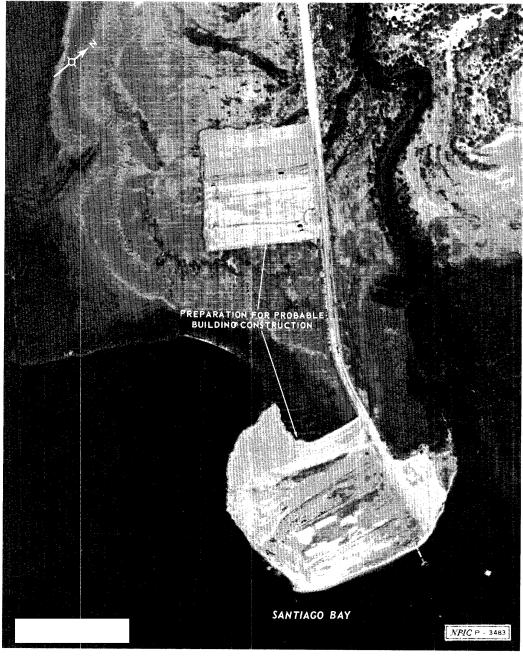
BUILDING CONSTRUCTION, PLAYA RANCHO LUN-. CIENFUEGOS AREA
